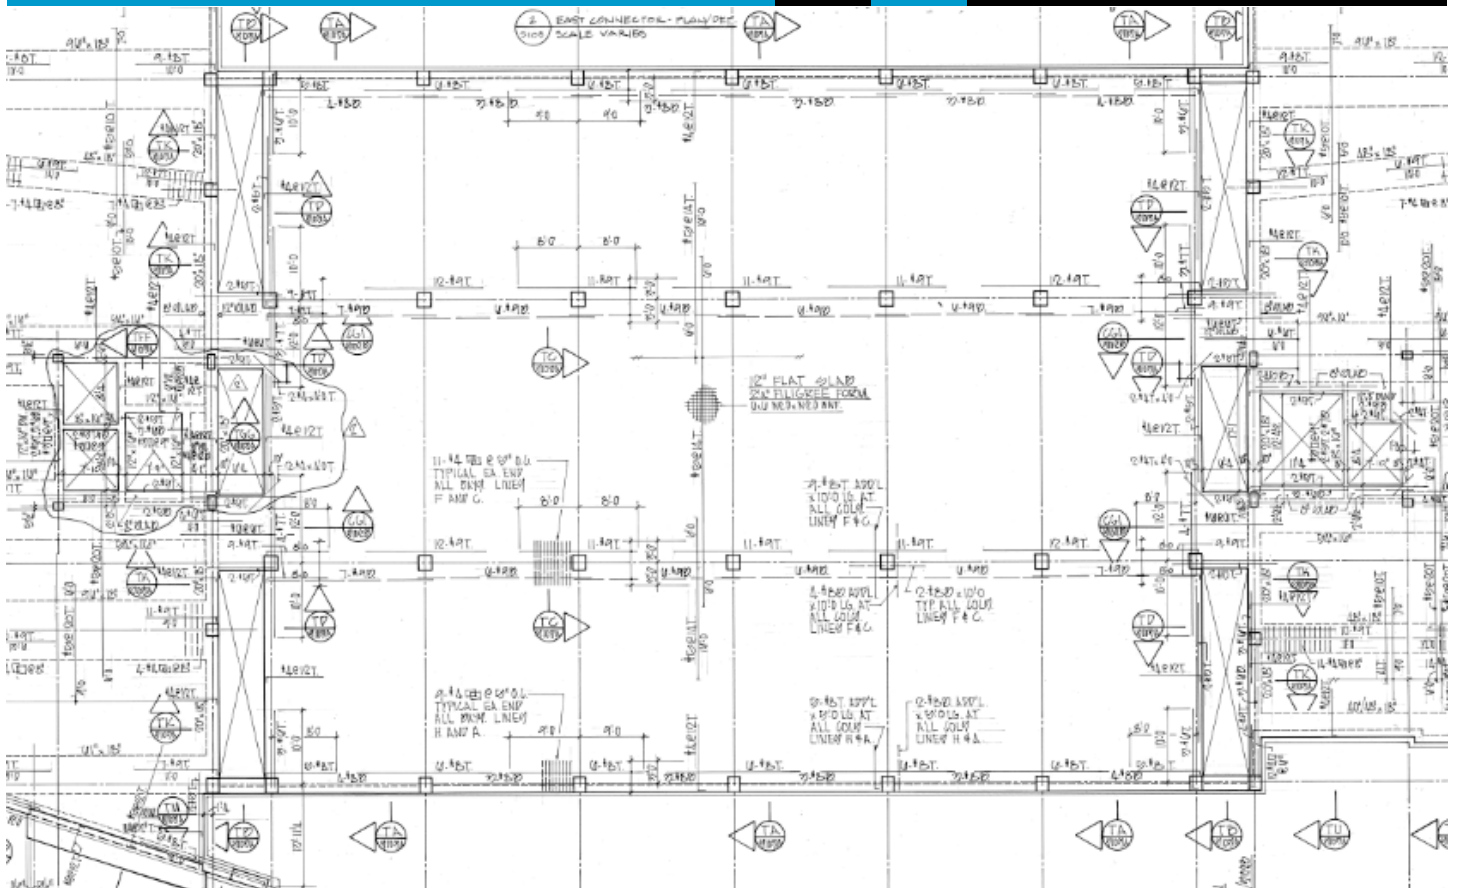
Typical Floor Plan - The three vertical openings on each side are for HVAC, electrical, and mechanical usage, and the openings just to the outside of these openings are elevator shafts.
